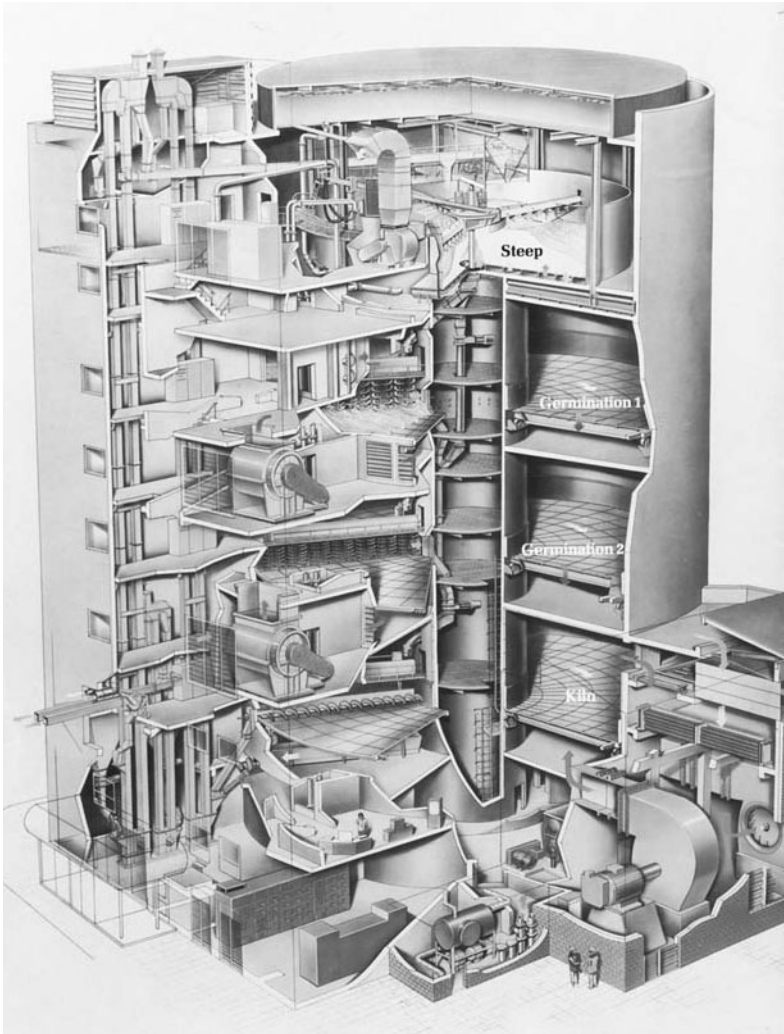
A tower malting plant. Courtesy of Bass Maltings.
